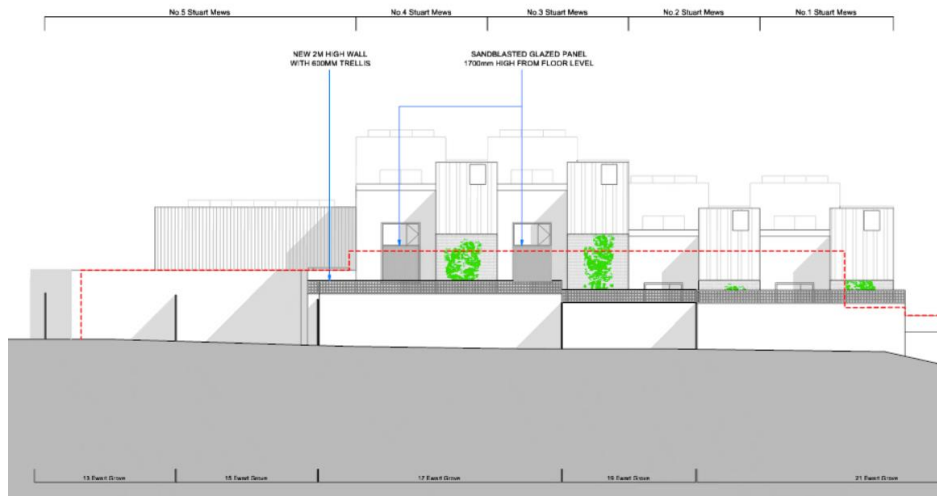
Mews units/ rear elevation viewed from Ewart Grove properties
